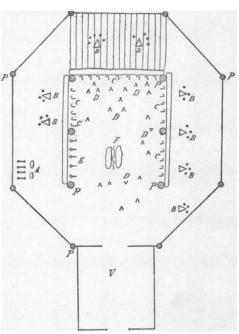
Plan of Underground House, illustrating Shrine; b, Lamps and women cooking; c, Men
